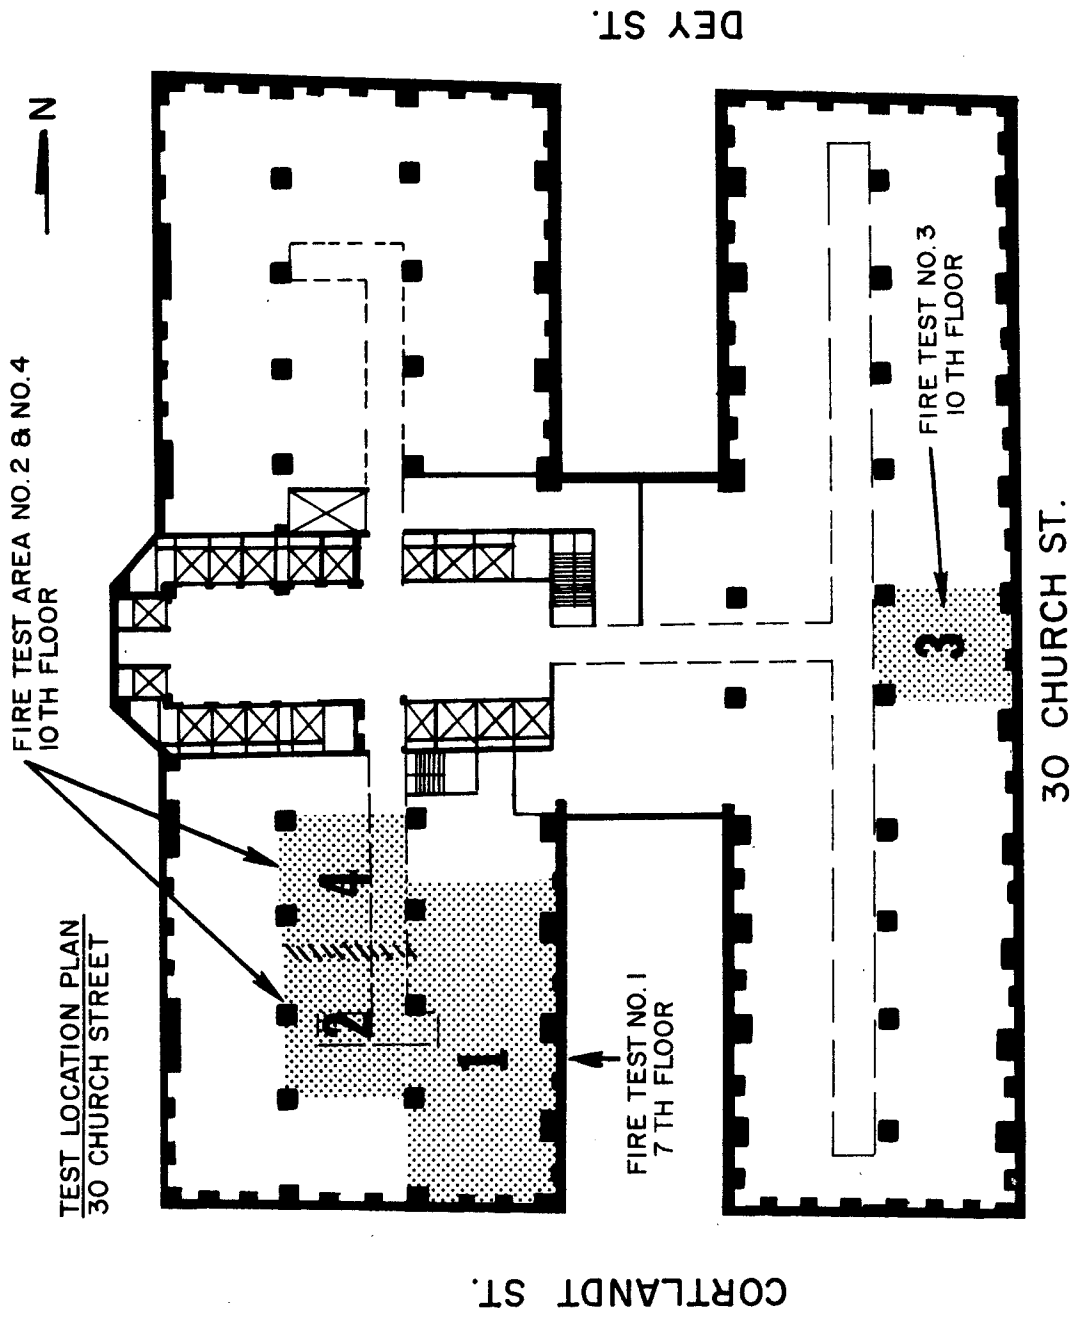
FIRE TEST LOCATION PLAN
